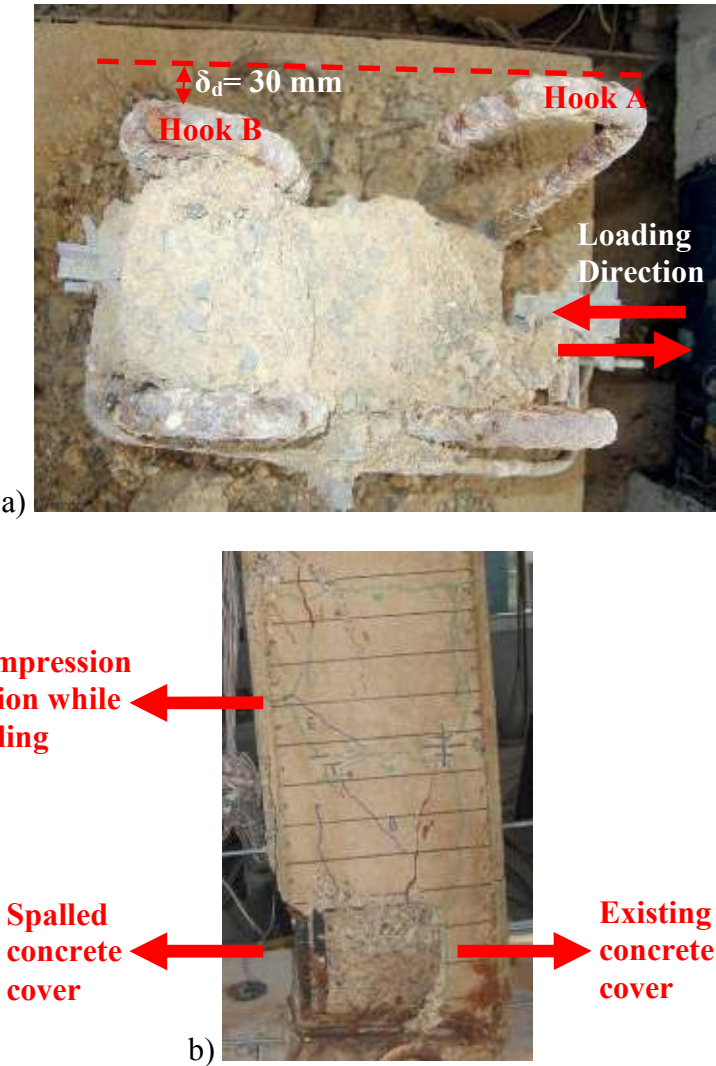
Views from a) Reinforcing cage of LS-X19-H, b) Damages of concrete of LS-X21 (after the test).
